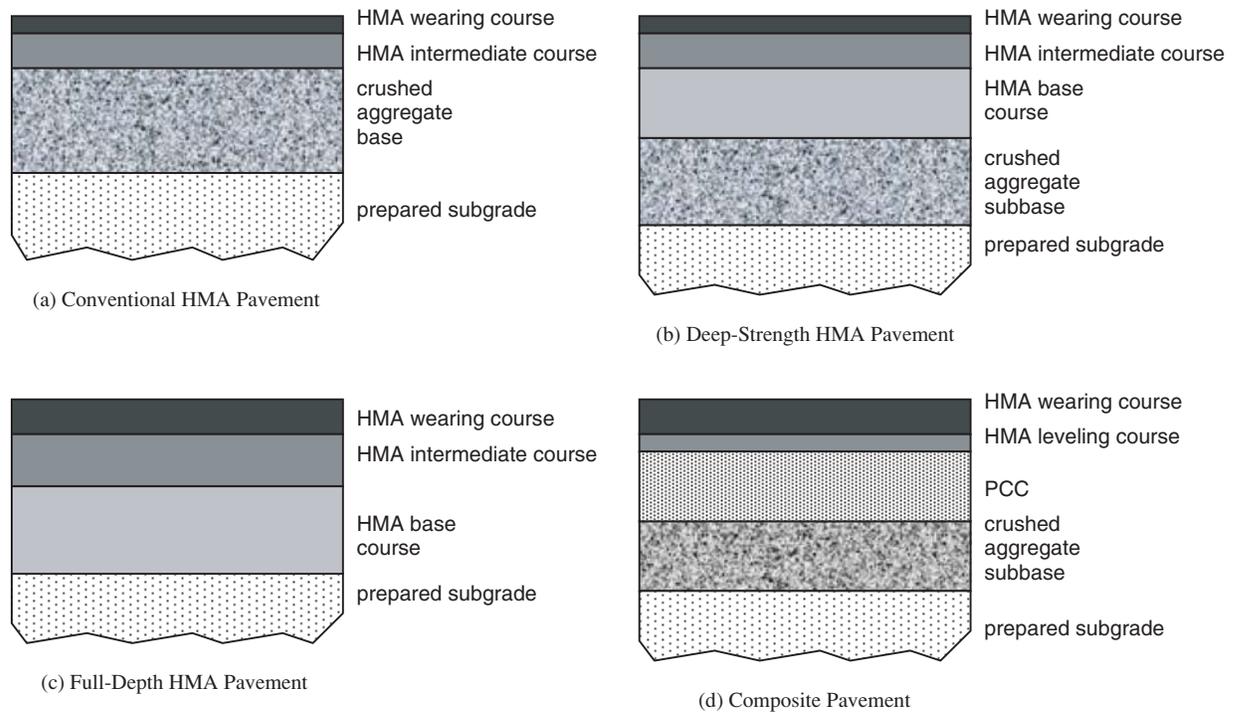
Cross-sections for typical asphalt pavements in new construction.
